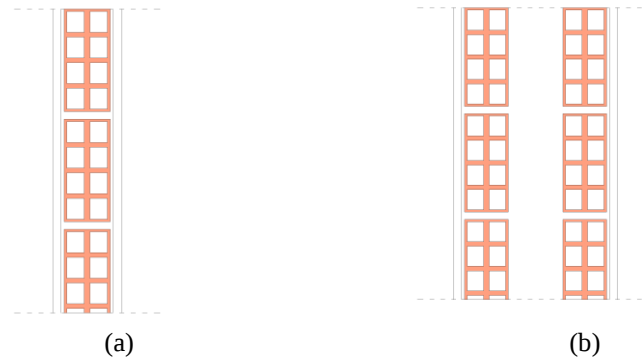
Wall cross section of a single leaf (a) and double leaves (b) masonry partition
